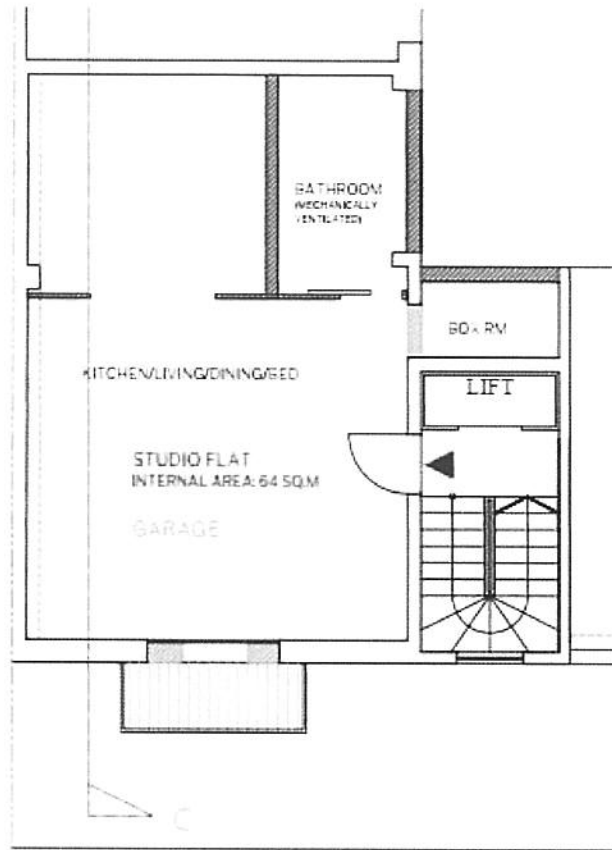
PA/00018/20; showing an approved studio apartment at ground level with bedroom which is obtaining natural lighting and ventilation from open plan area. From underlying site photo, it is amply clear that the site was previously a garage.
